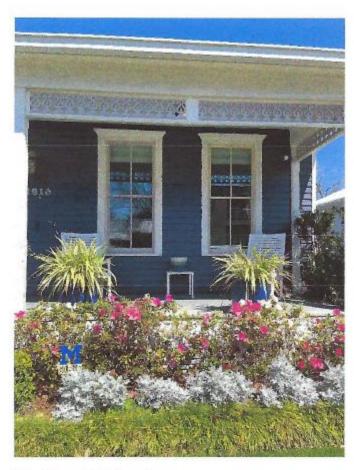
Applicant Supplied Photo with New Windows on Porch
